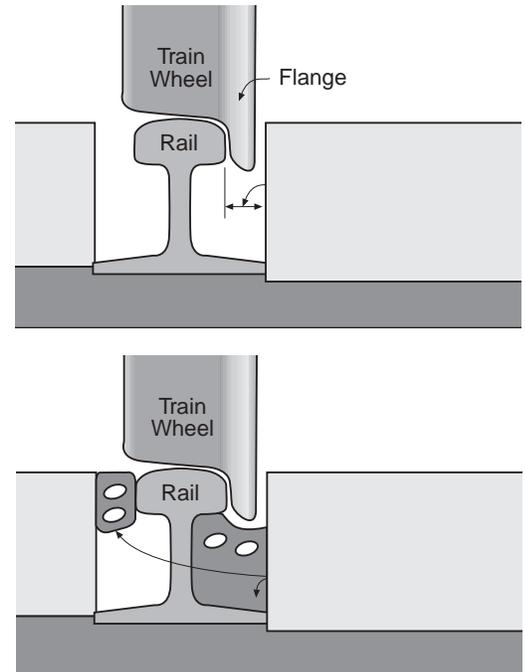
Fillers can completely eliminate the field flangeway gap but must allow for the train wheel in the gauge flangeway.
